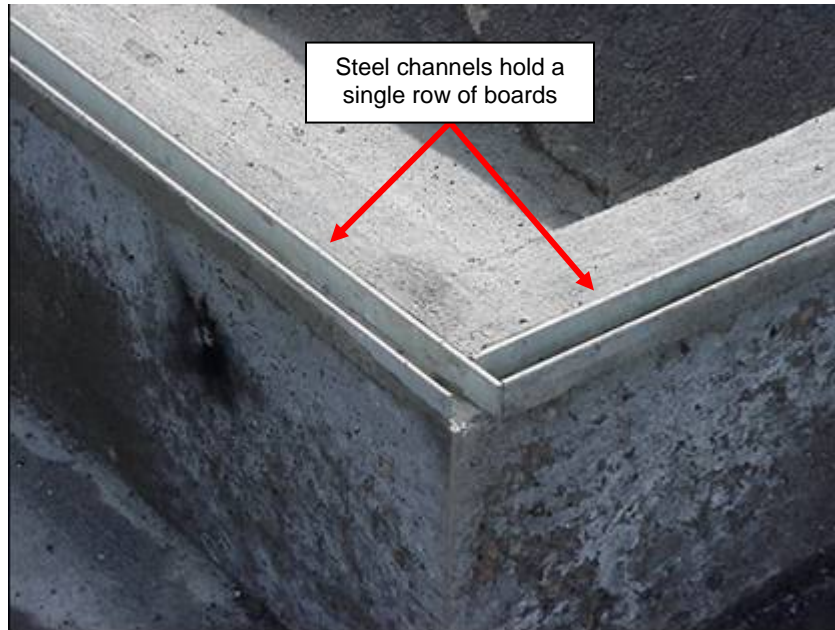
A steel channel placed in the top of the concrete walls of a long-crested weir holds a single row of flashboards for adjusting the final crest elevation.
